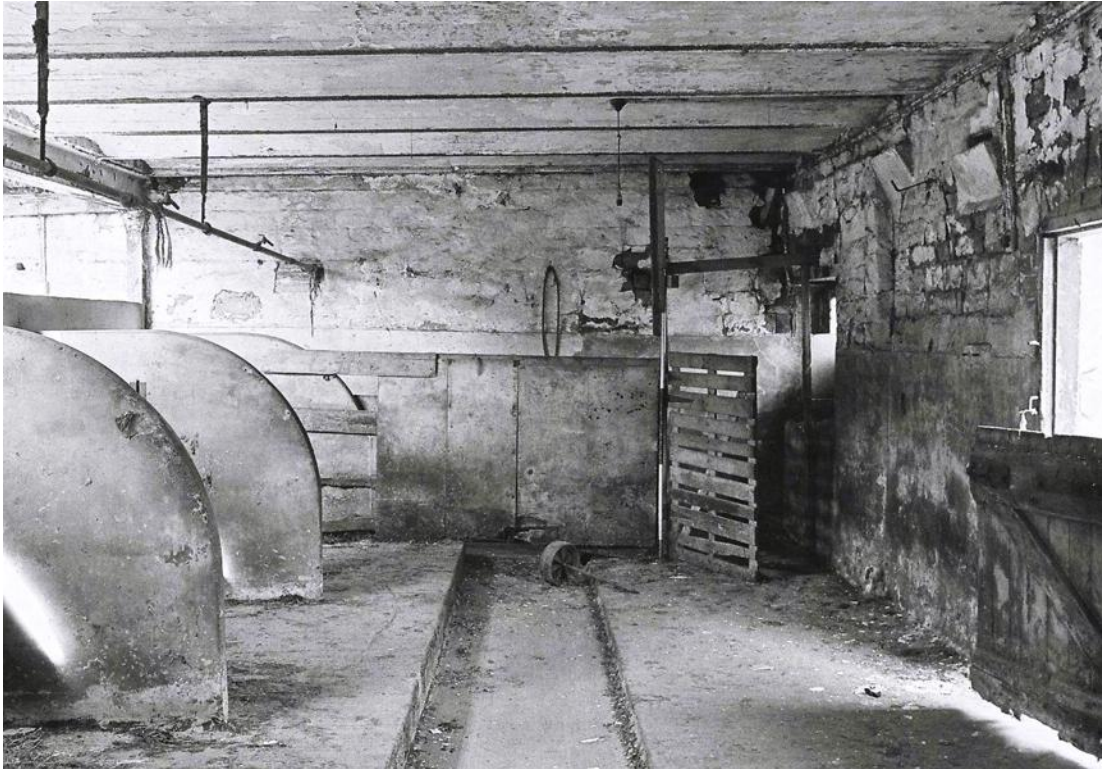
Shaw House Farm: Later Barn Interior Ground Floor. Facing South.
